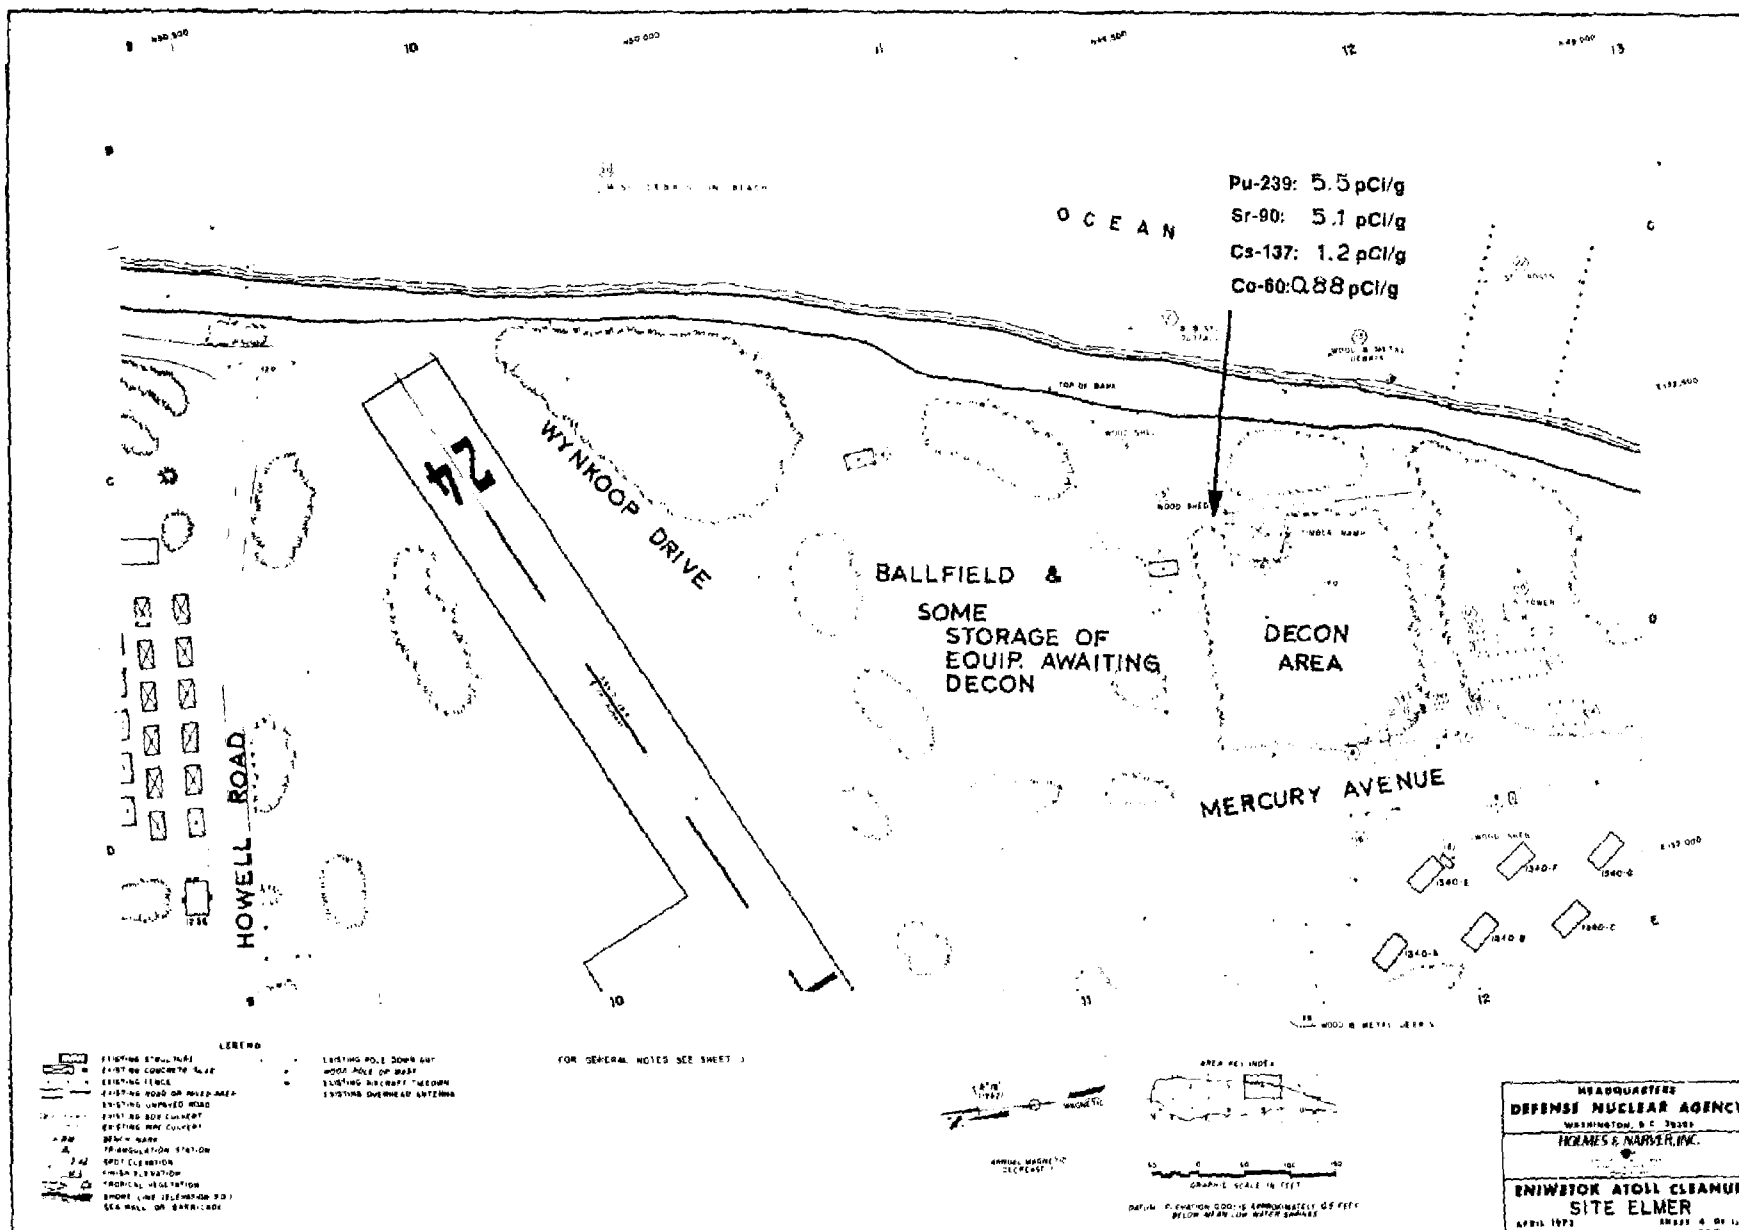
SITE ELMER, SHEET 4 OF 11
